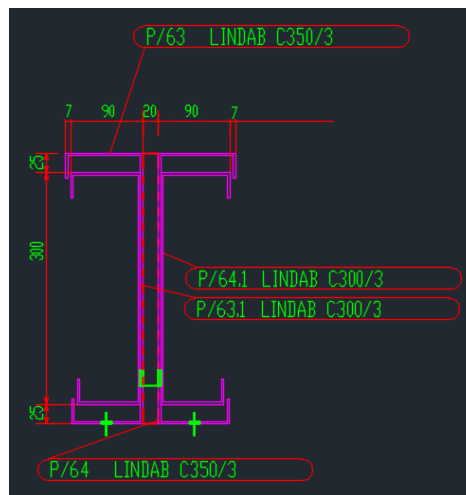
Strengthening the cross-section of the columns and beams of the main frame
